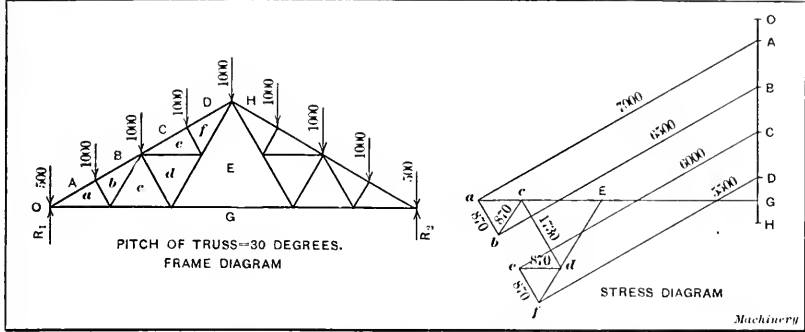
Frame and Stress Diagrams for Eight-panel Fink Roof Truss
